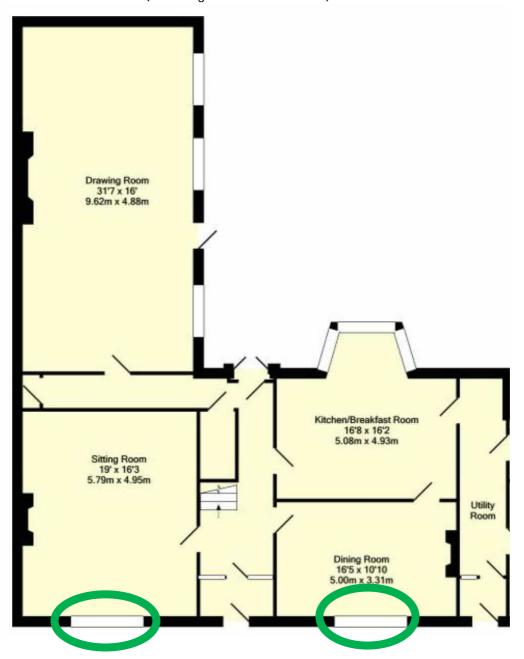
Plan of Ground Floor showing location of 2 x 1 over 1 pane sash windows to be replaced [indicated by a green circle]
